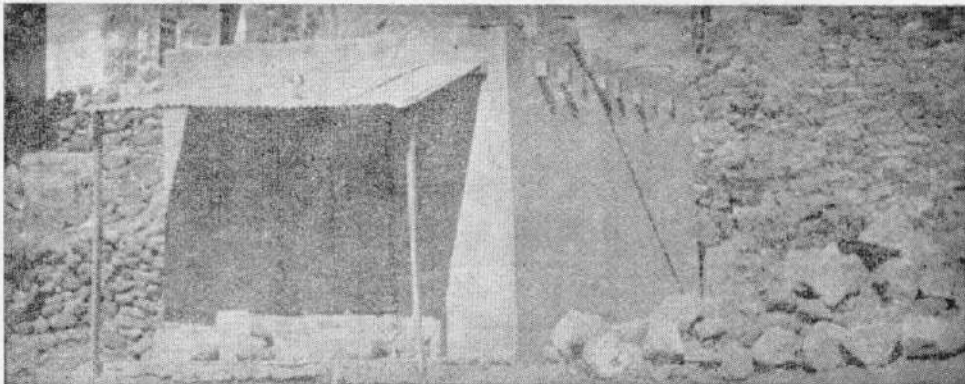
A single storied (apparently newly built) ration shop located at the foot of the hill was not damaged in village Dohran. See cement plaster outside the walls.
